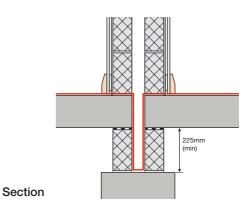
Gas membrane dressed around cavity at ground floor junction.
